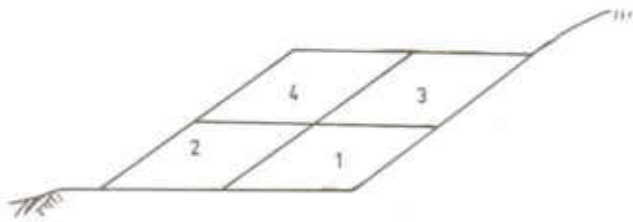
TYPICAL LAYOUT OF HAZARDOUS WASTES LANDFILL
